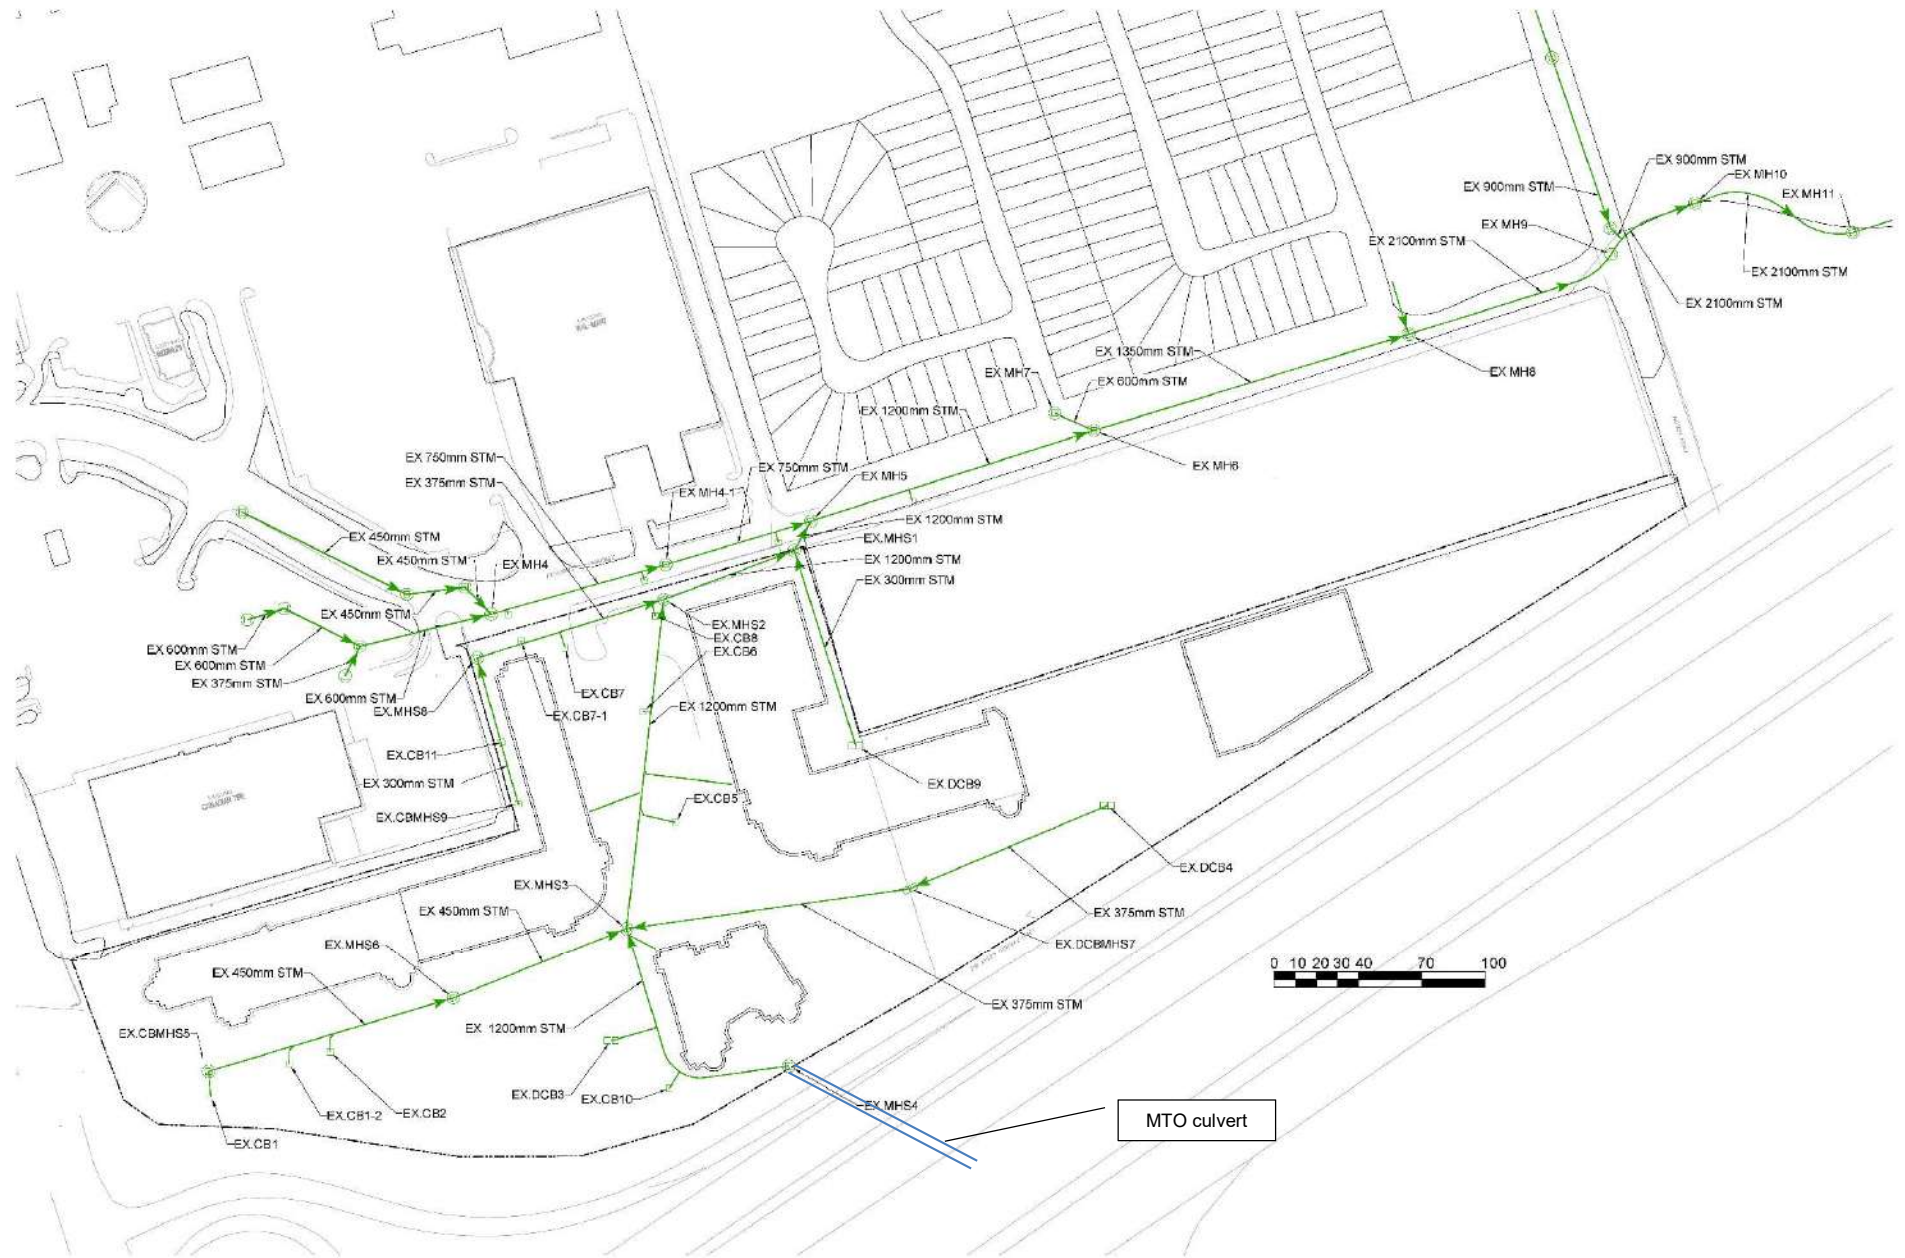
City layout of existing Storm sewers and Site sewers
